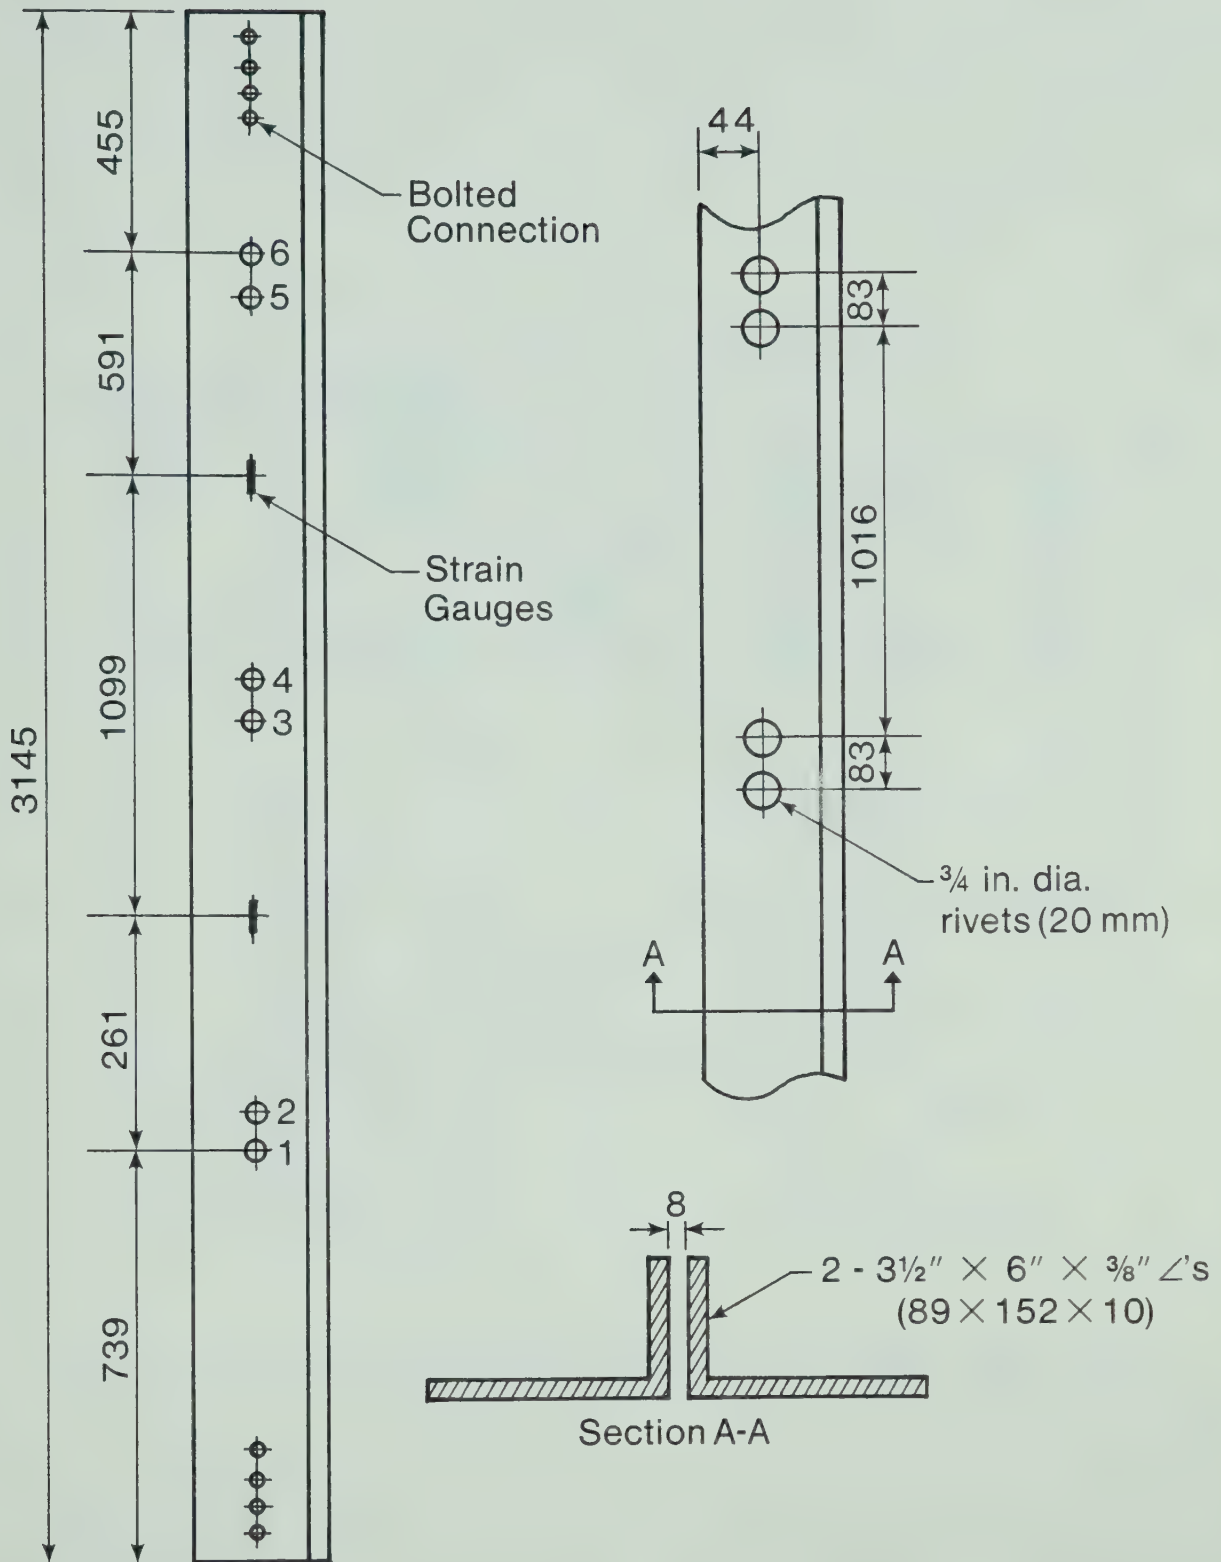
Specimen Details of Bridge Members Taken from Service
